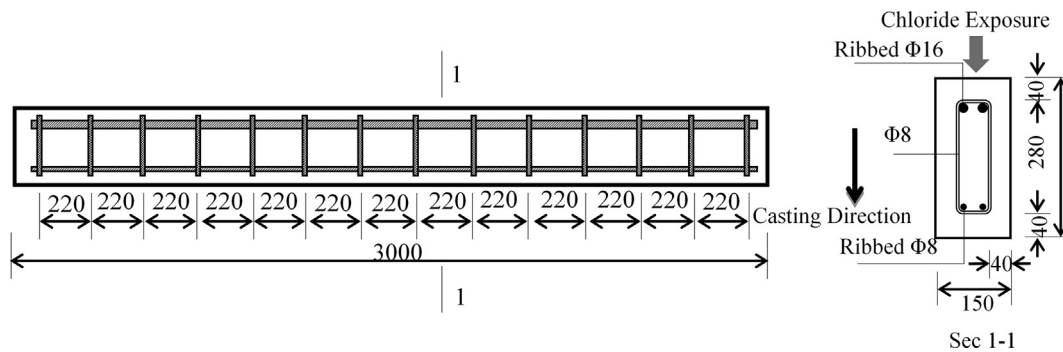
Reinforcement layout of type A beams. (Dimensions are all in mm).
